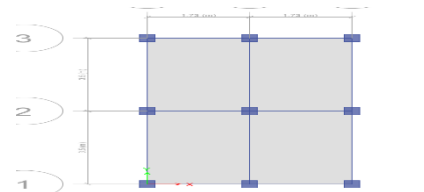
(a): plan view 60<sup>0</sup> inclination
